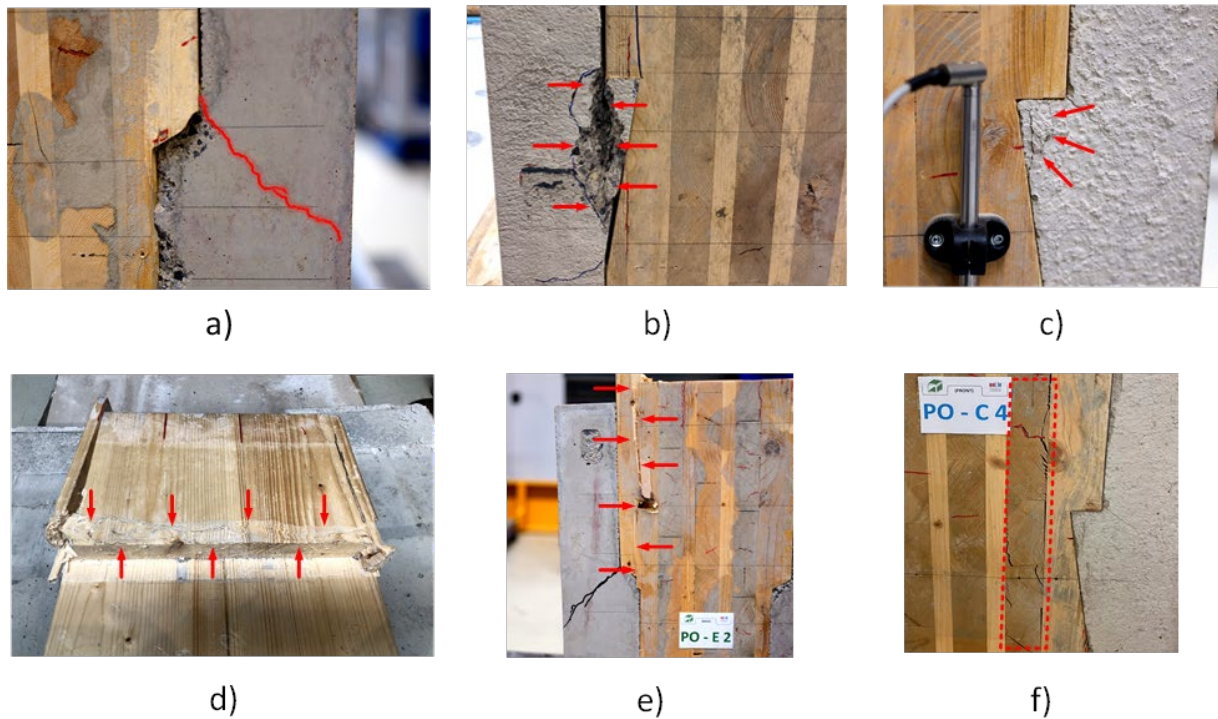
Failure modes of the notched connection: a) crack in concrete; b) shear failure at the notch; c) crushing of concrete; d) compression failure in timber at the face of the notch; e) shear failure in timber; f) rolling shear failure in CLT.
